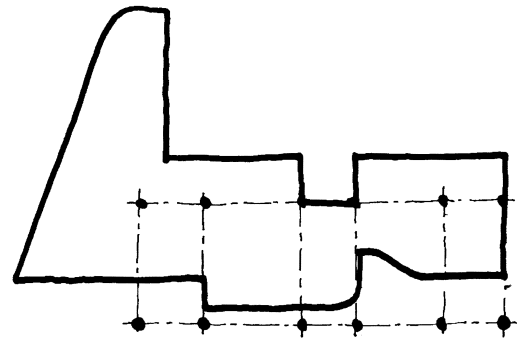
Harding and Tecton, *'Six Pillars' Dulwich, London, 1934*. Ground floor.
